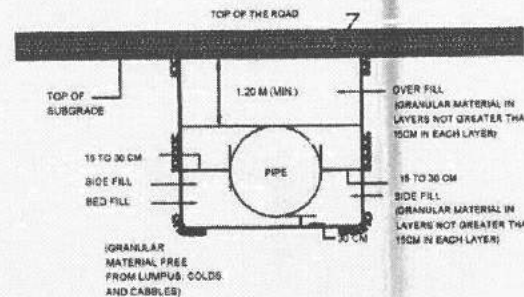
INSTALLATION OF PIPE FOR ALONG THE ROAD
